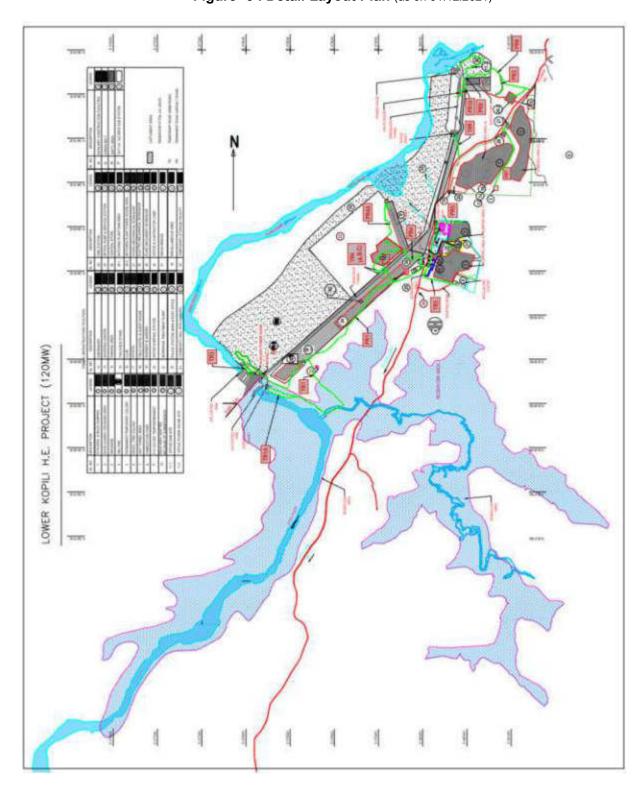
Detail Layout Plan (as on 31.12.2021)
